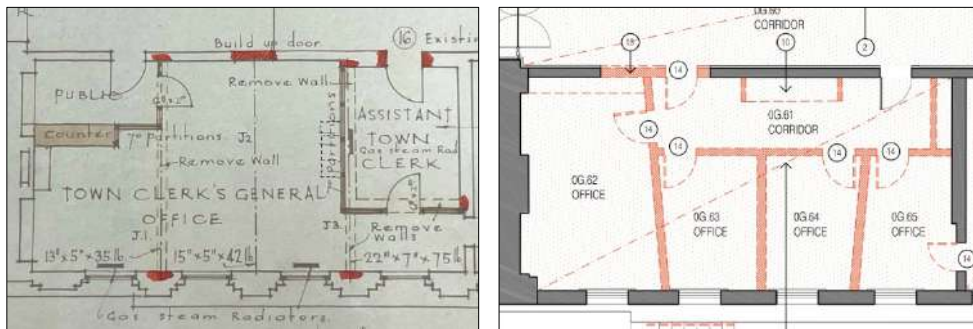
(left) 1938 plan of former Council offices on the ground floor, east of the main entry.
